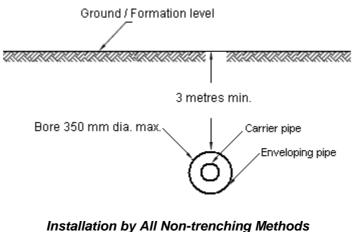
Enveloping Pipe and Venting Arrangement- Underground Gas Pipeline Courtesy of APA Group
